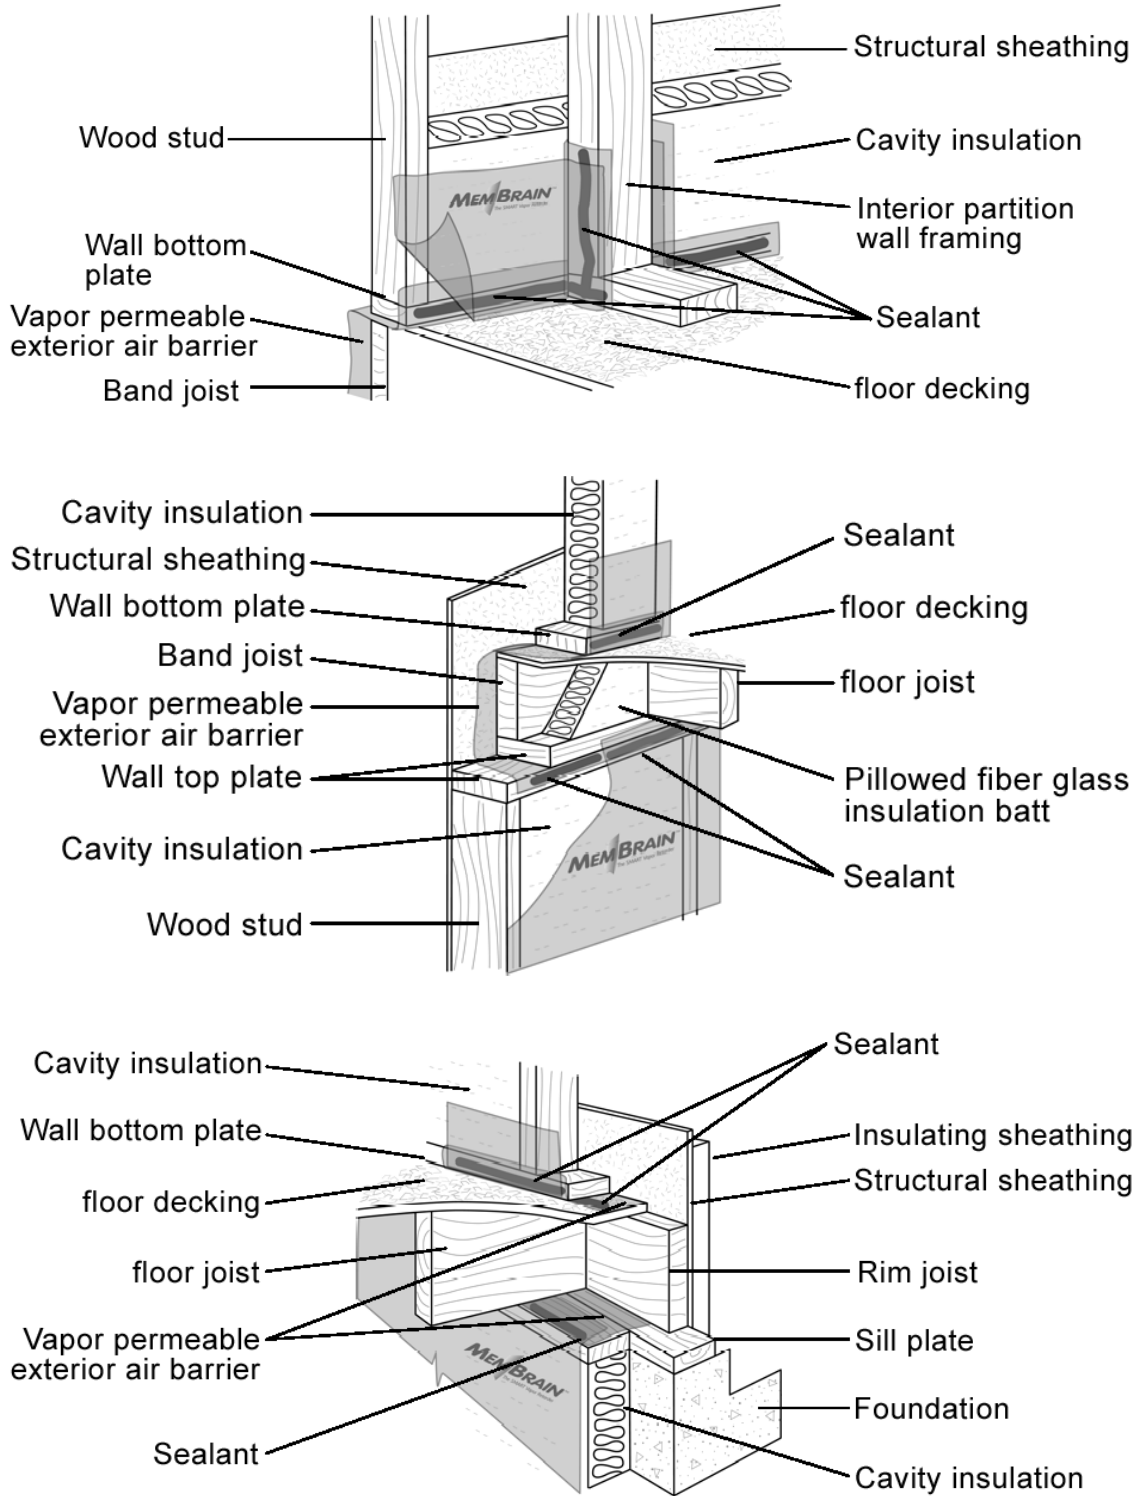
"MemBrain™" details for continuity across floor plate and at intersecting interior walls.
